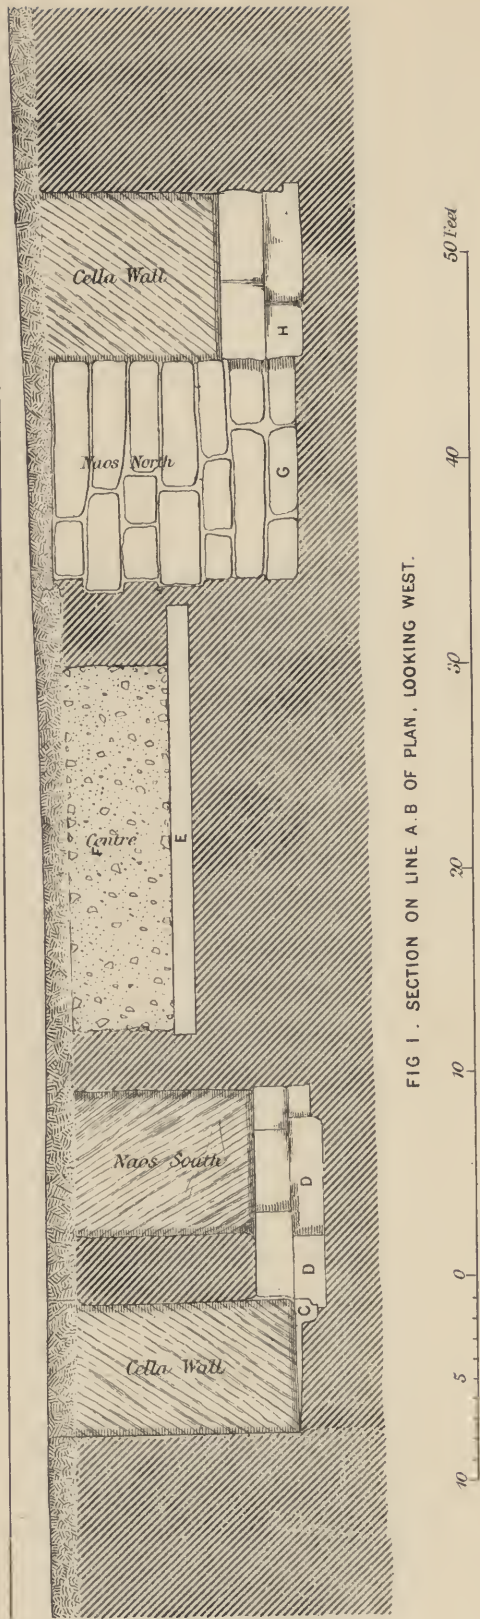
SECTION ON LINE A. B. OF PLAN, LOOKING WEST.
